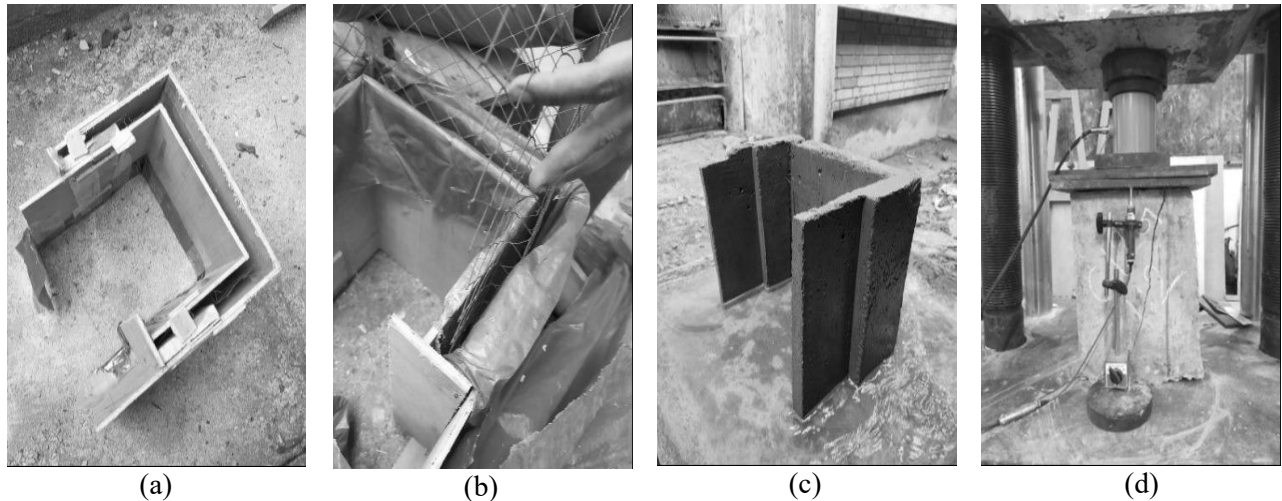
Experimental layout: (a) Formwork; (b) Mesh placement; (c) Pre-cast jacket; (d) Test setup
